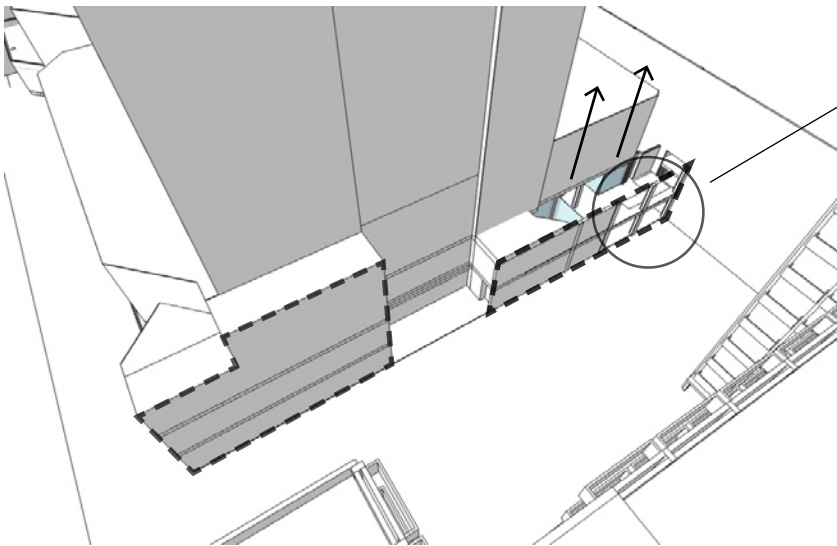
Remove brick in-fill and existing corrugated steel roof.
